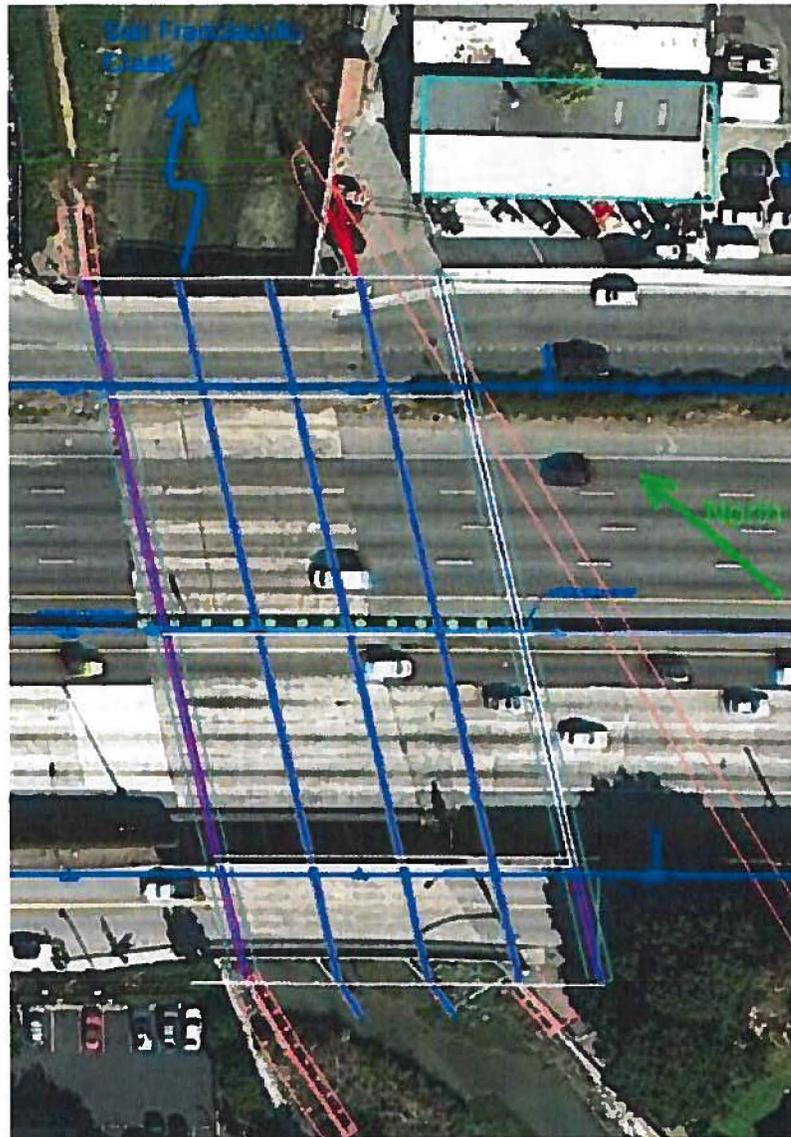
Aerial View of Existing San Francisquito Creek Bridge with Proposed Bridge Superimposed
